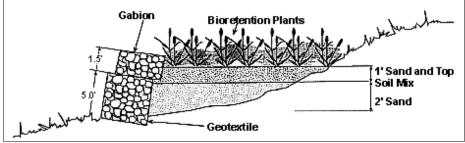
Cross section of an on-line rain garden formed by damming a grass swale with a mild to moderate slope with gabion baskets (*CH2M Hill, 1998*).
